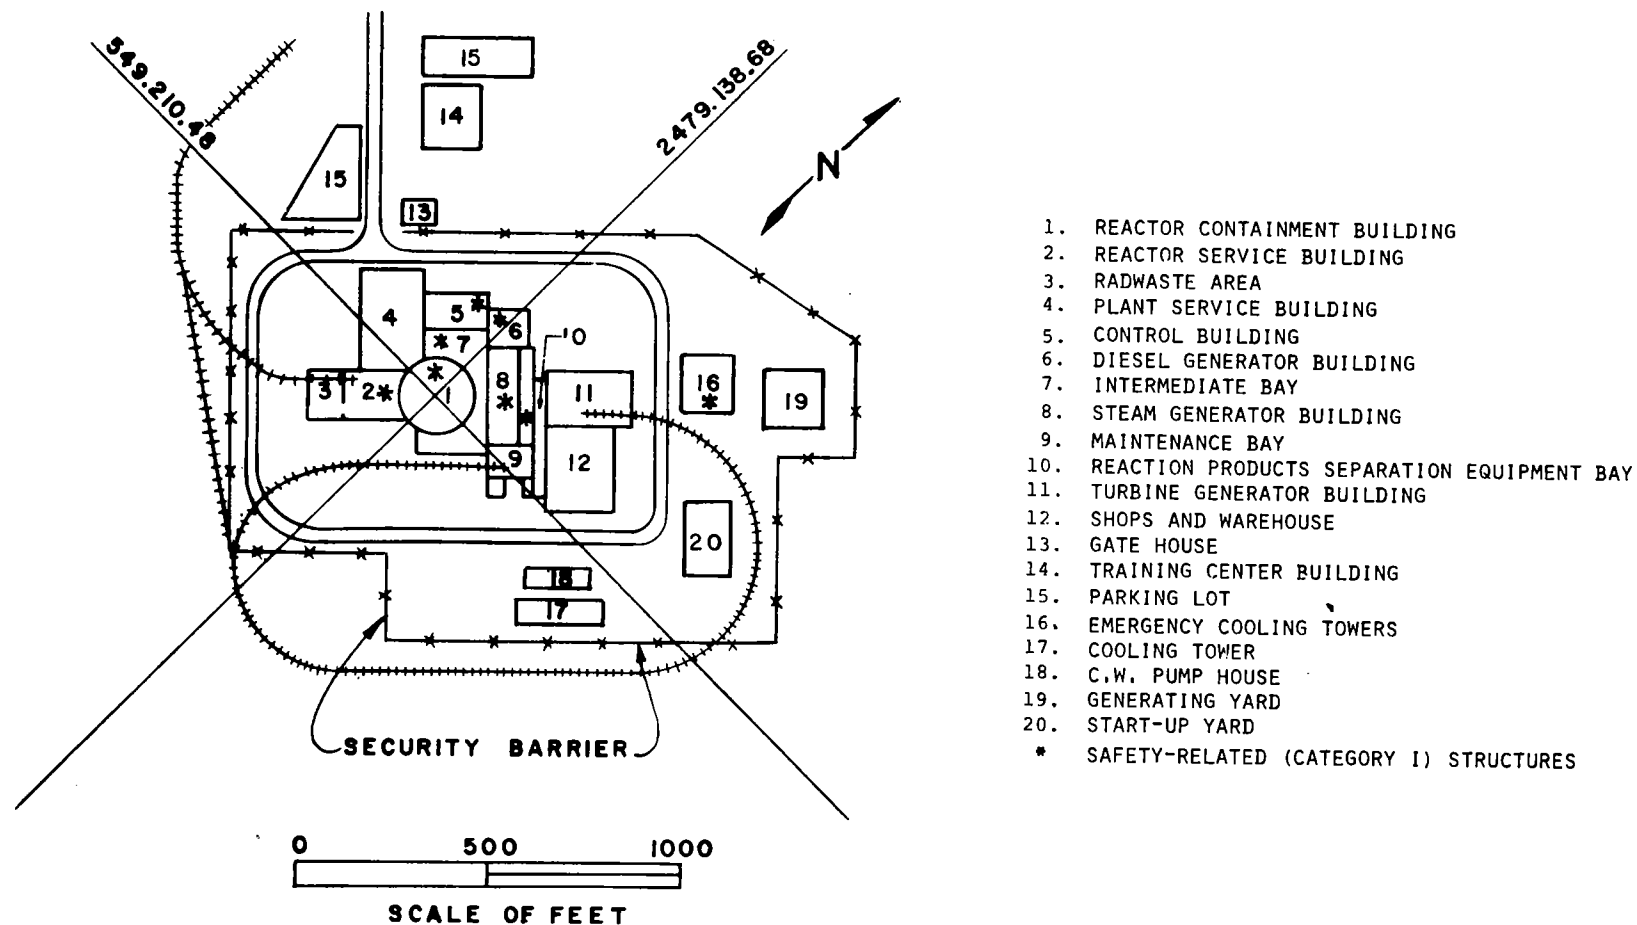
ARRANGEMENT OF PLANT STRUCTURES
